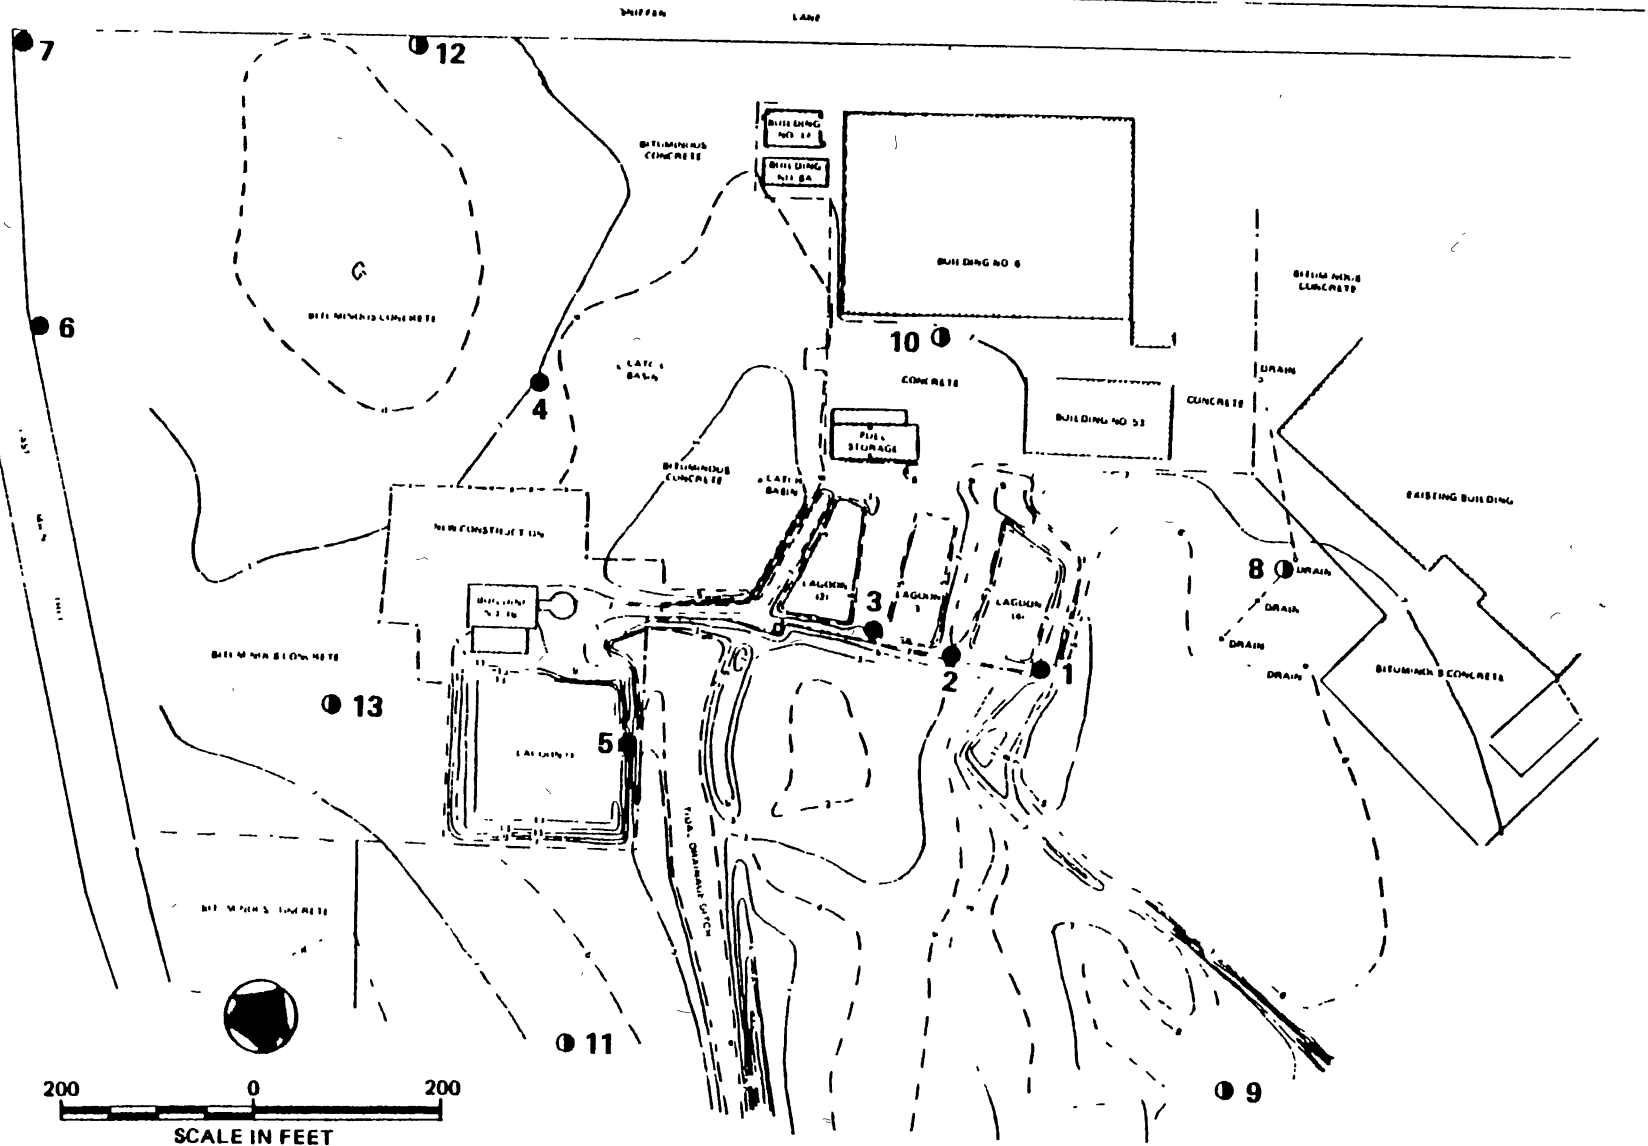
SITE PLAN - AVCO LYCOMING FACILITY
